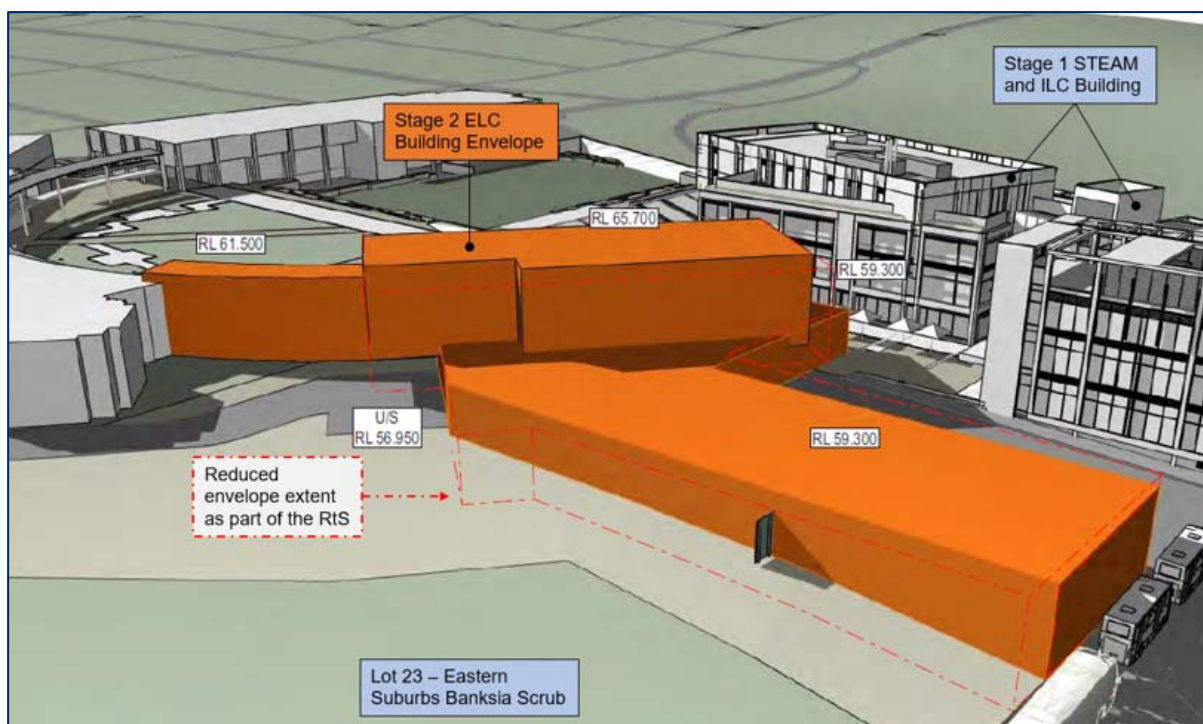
| Stage 2 ELC building envelope – eastern perspective (Source: Applicant's RtS)
